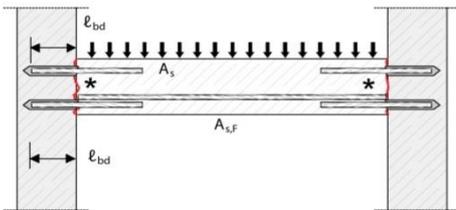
Anchoring of reinforcement to cover the line of acting tensile force.
